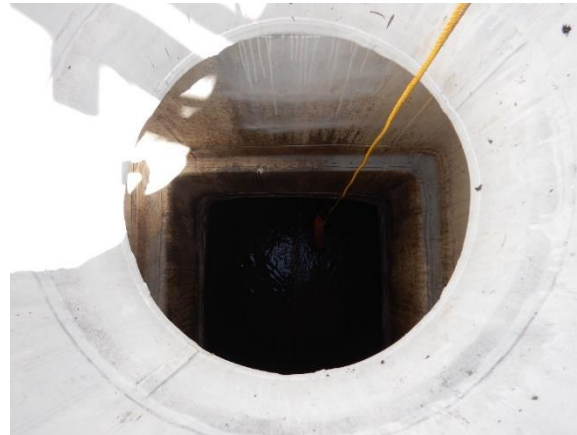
MH S55. PVC lined manhole structure in good condition.
